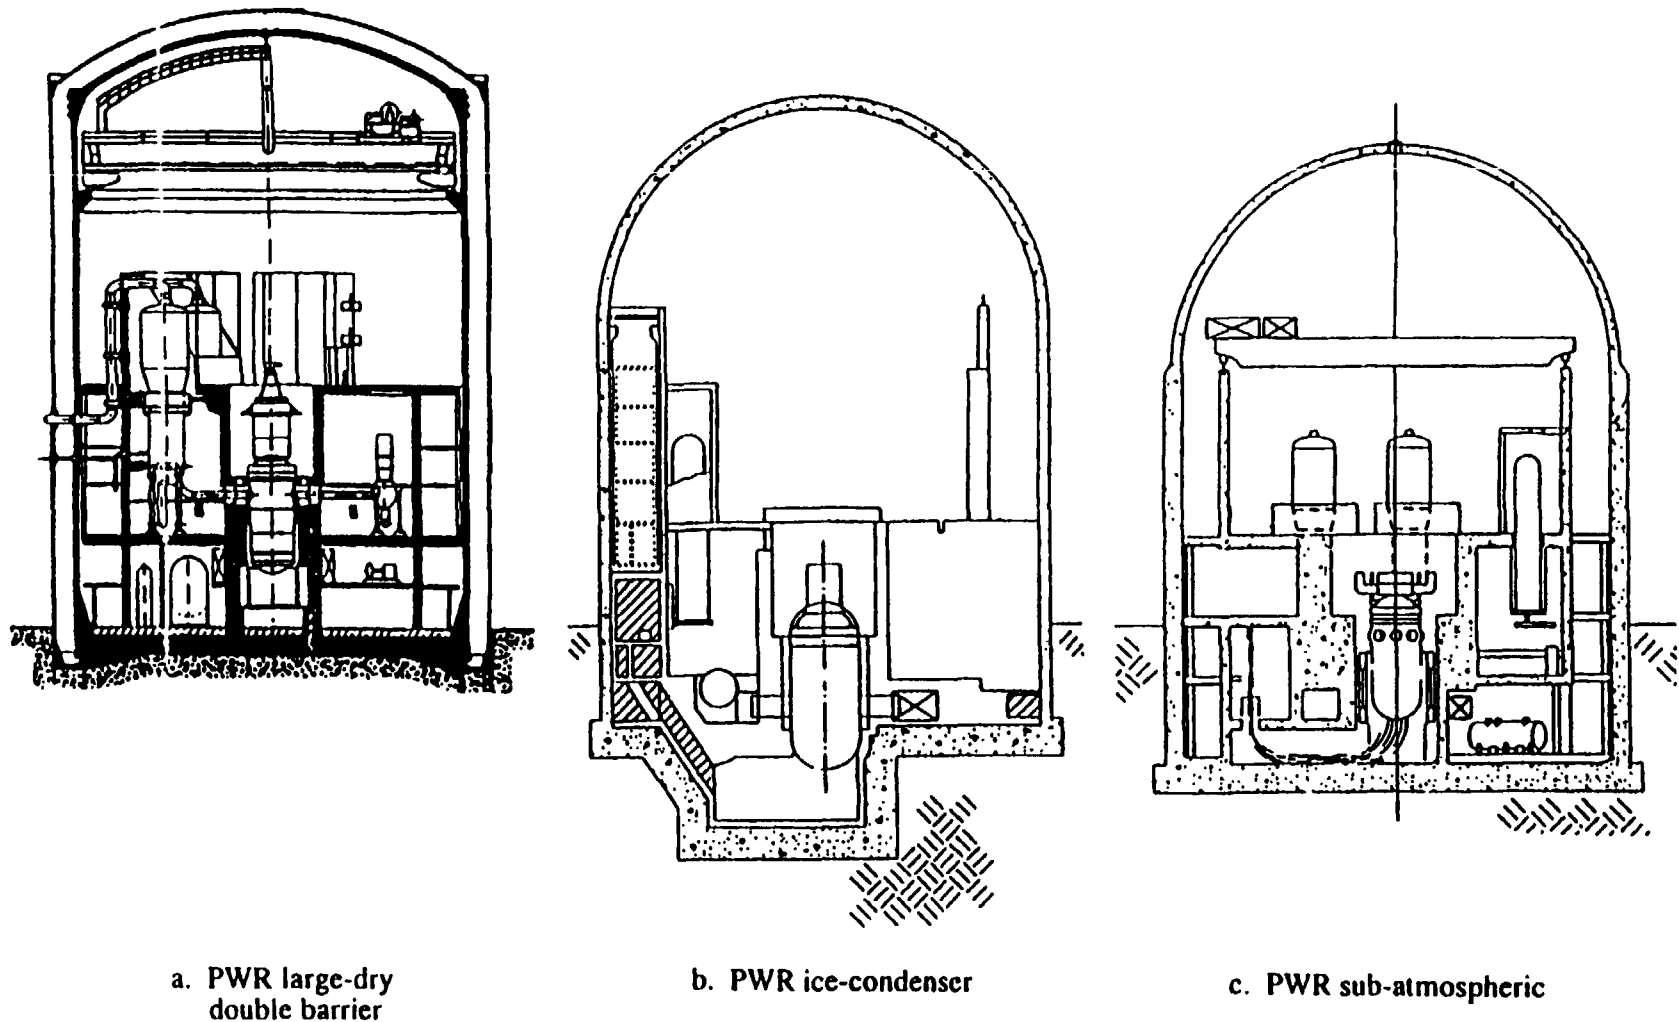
Examples of PWR concrete containment cross-sections.
